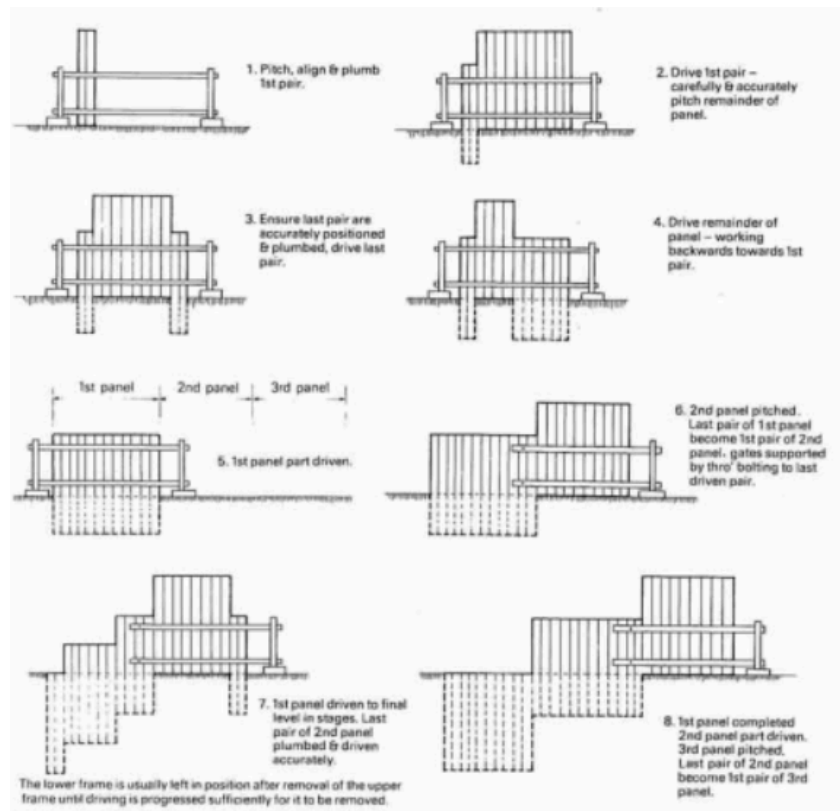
Panel Driving method for sheet pile installation (Steel sheet pile installation, 2004)
